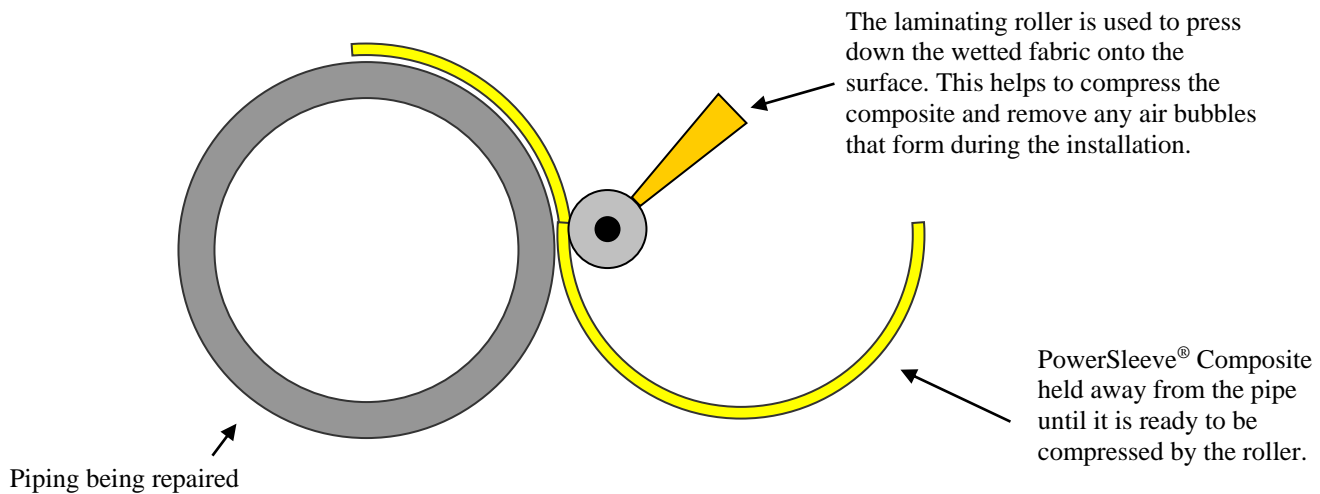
A laminating roller can make installations onto high temperature surfaces much easier. This tool can also be used on large flat surfaces where Stricture Banding™ cannot be effective.
